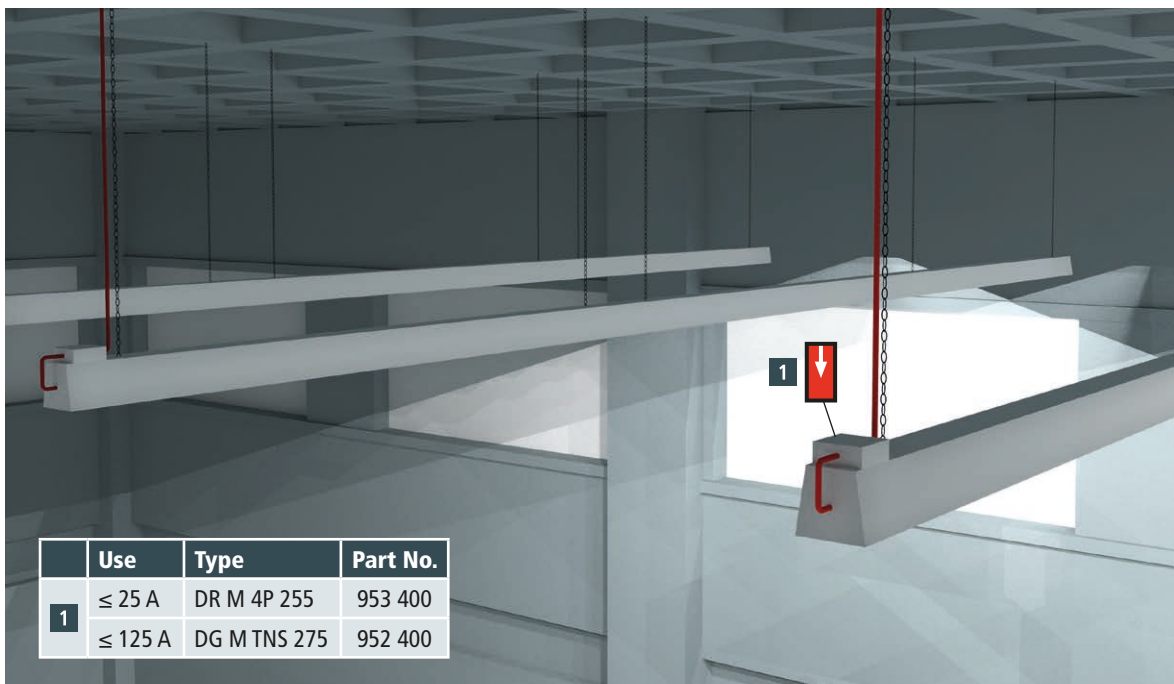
Type 2/type 3 surge arrester in a flush-mounted enclosure installed on the mounting rail of a light strip
